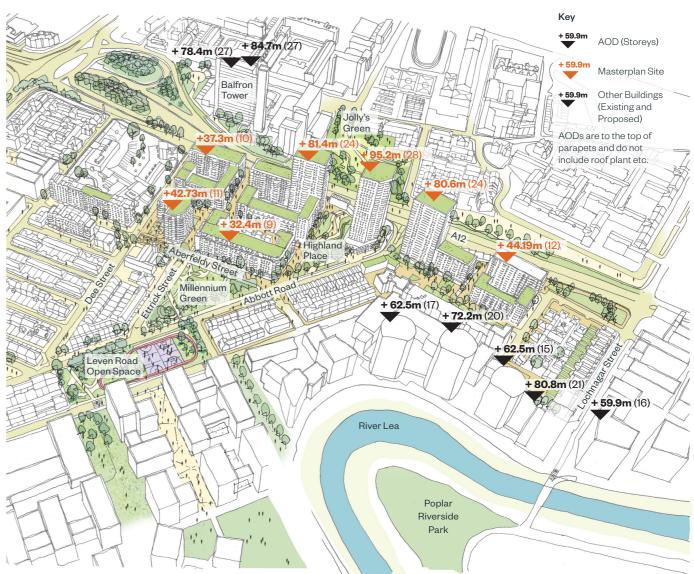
Illustrative axonometric view showing indicative AODs within the masterplan Site and some key existing and proposed buildings in close proximity to the Site
